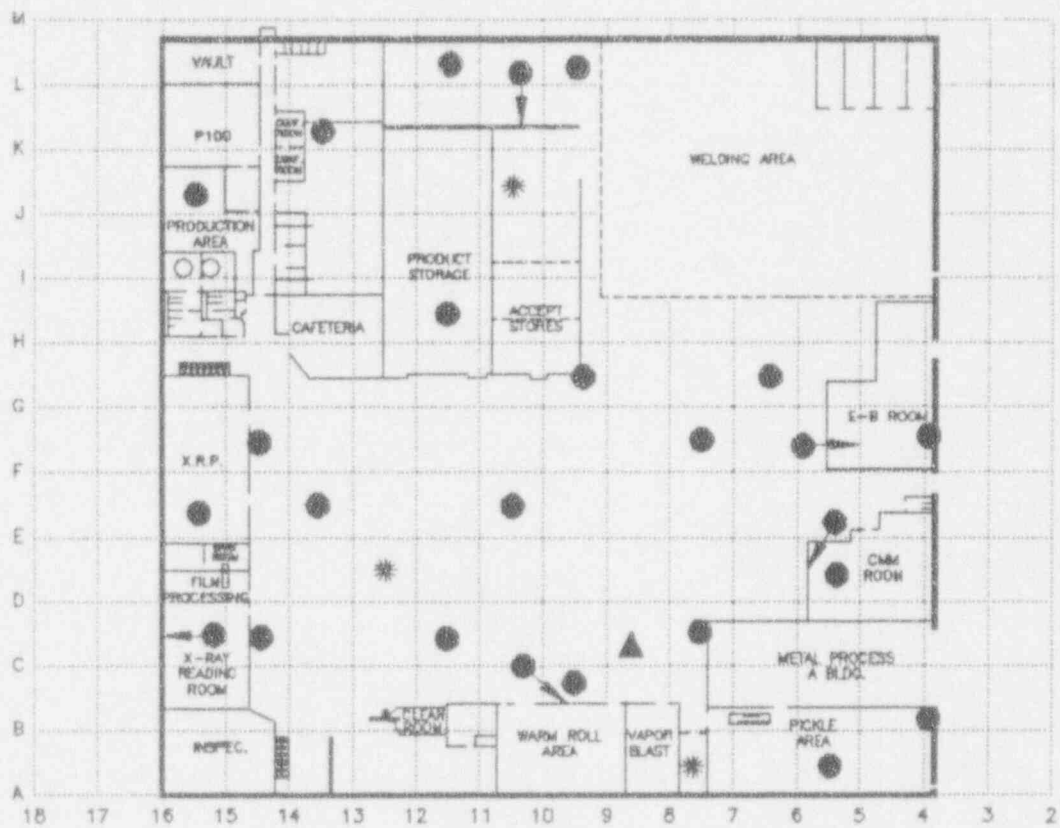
Building B North, Stores Mezzanine – Measurement and Sampling Locations
